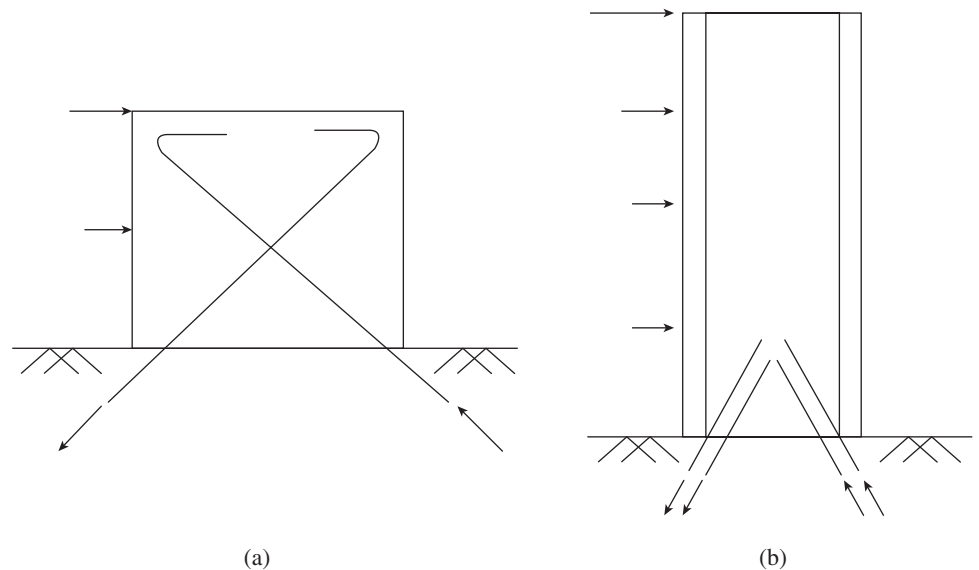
Diagonal reinforcement in walls (a) Squat walls (b) Cantilever walls
